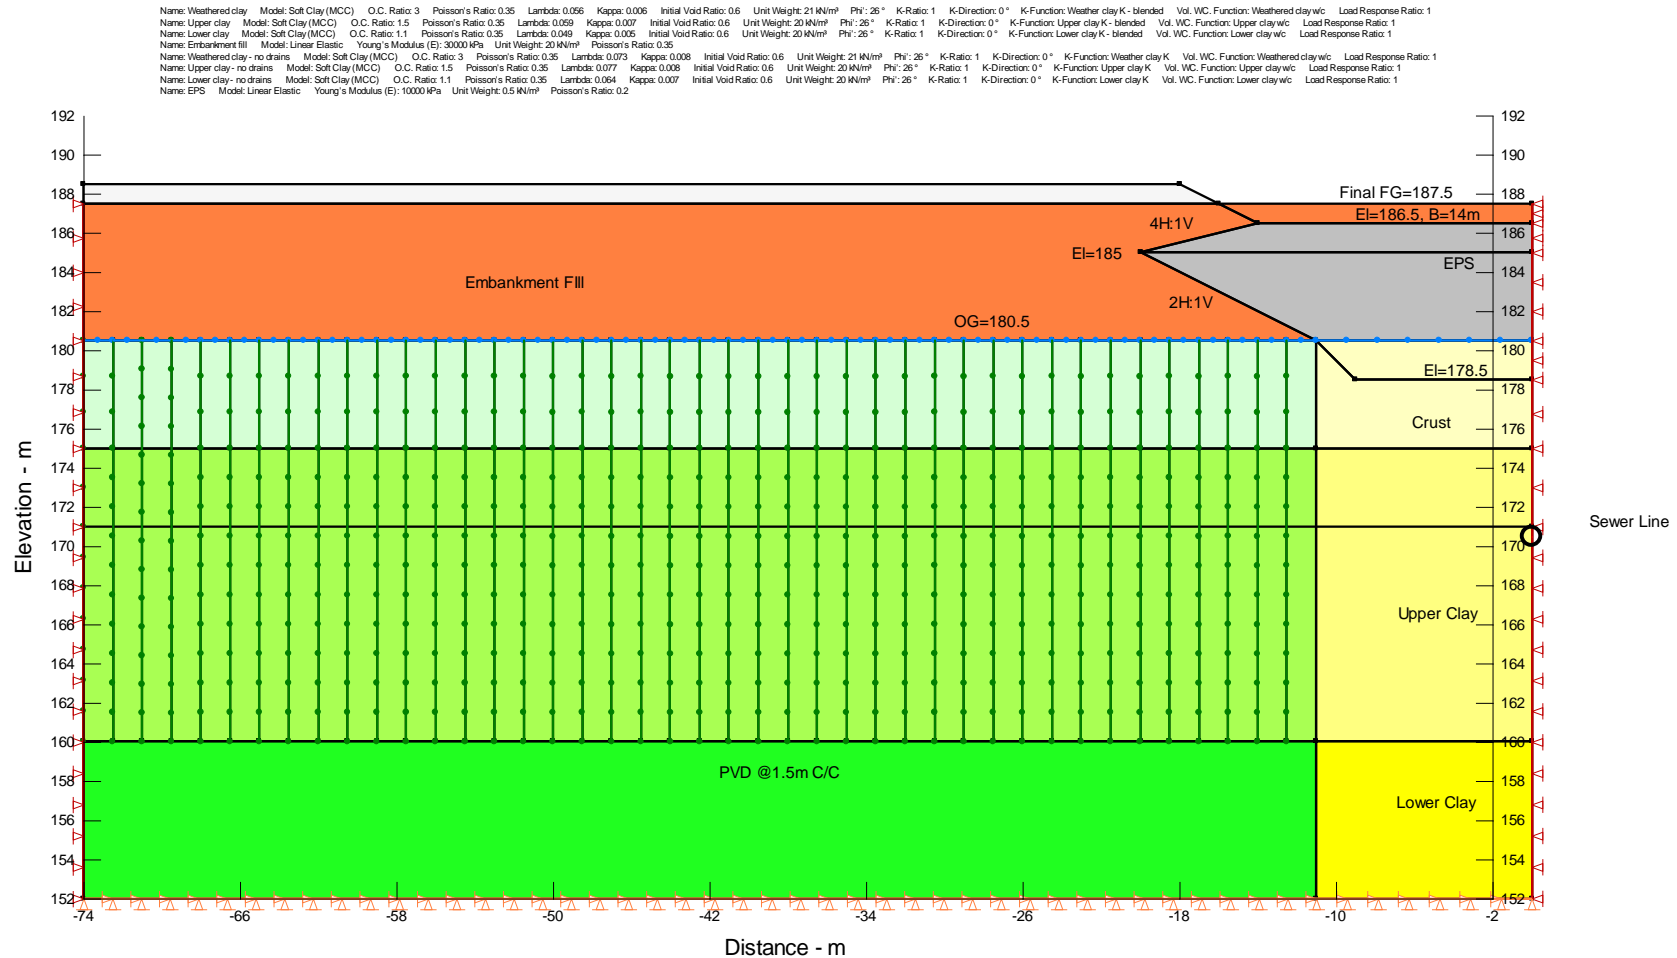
EPS Configuration at Sewer Line under Highway Embankment at Second Street
